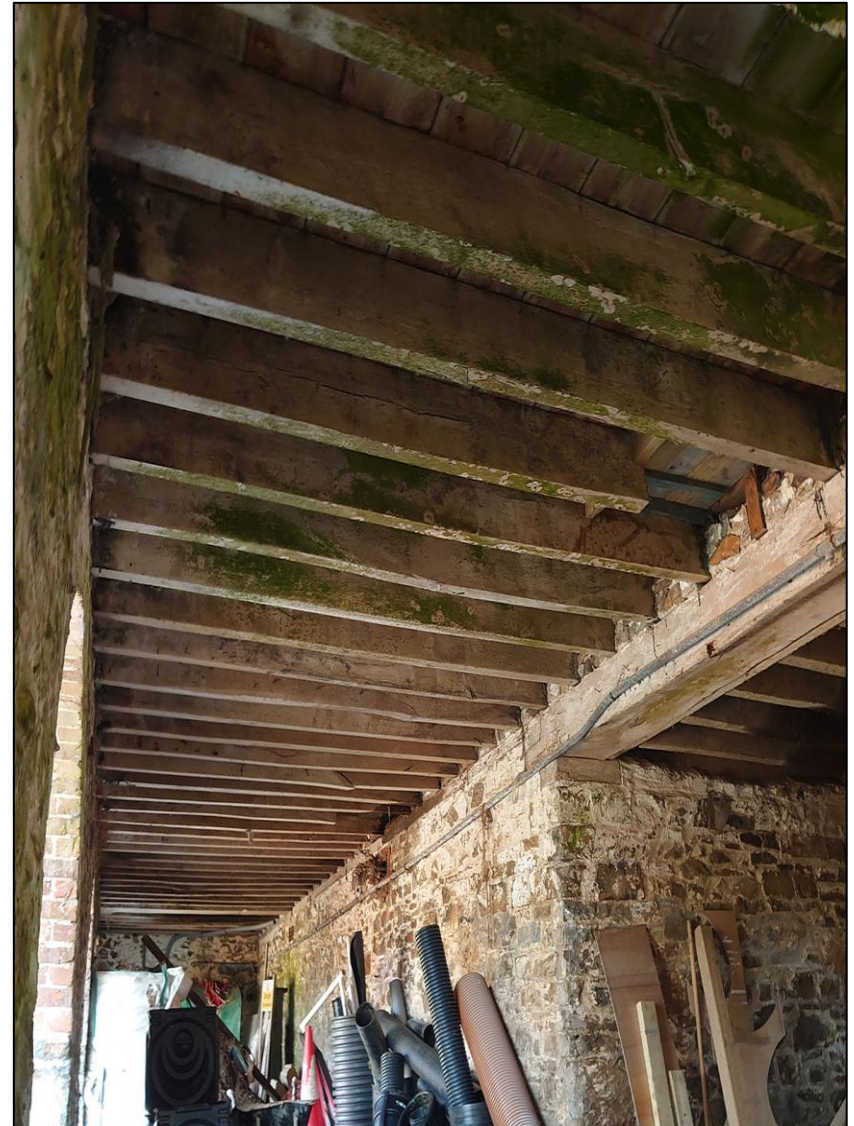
THE LOWER GROUND FLOOR OF THE BUILDING.
